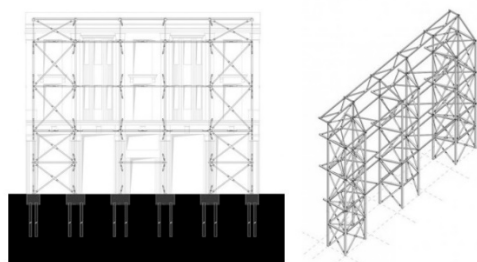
Left: Drawing of the supporting structure of the historic façade. Right: 3d view of the supporting structure.
